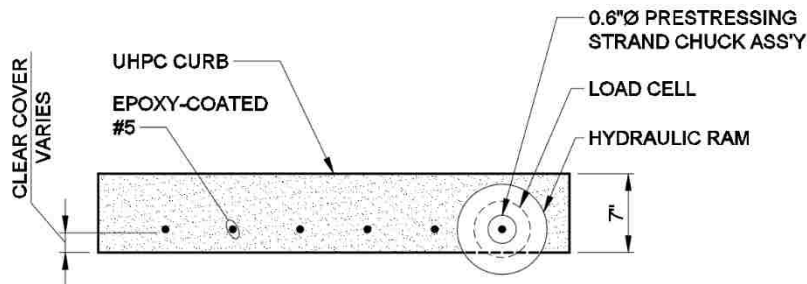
Plan view of a pullout curb with testing apparatus shown on one specimen.
